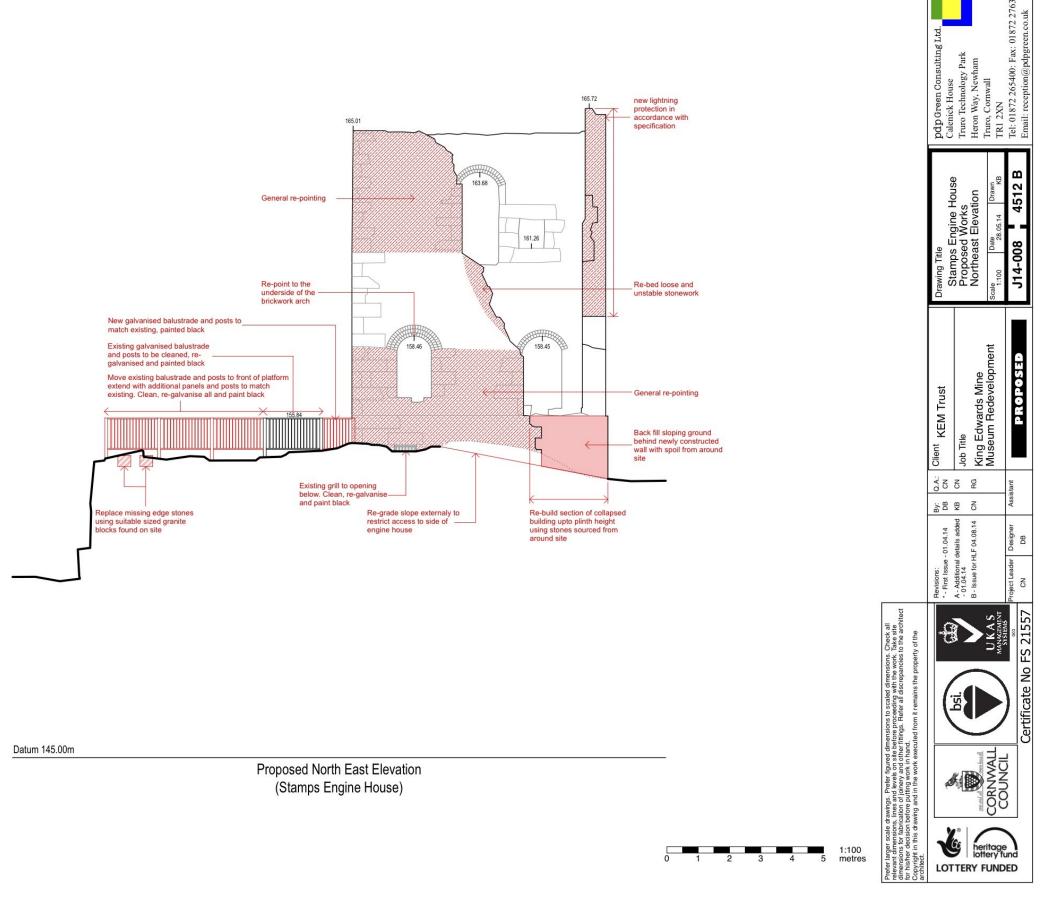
North east elevation of the proposed works to the Stamps engine house (PdP Green Cons. Ltd Dwg No. 4512B)
